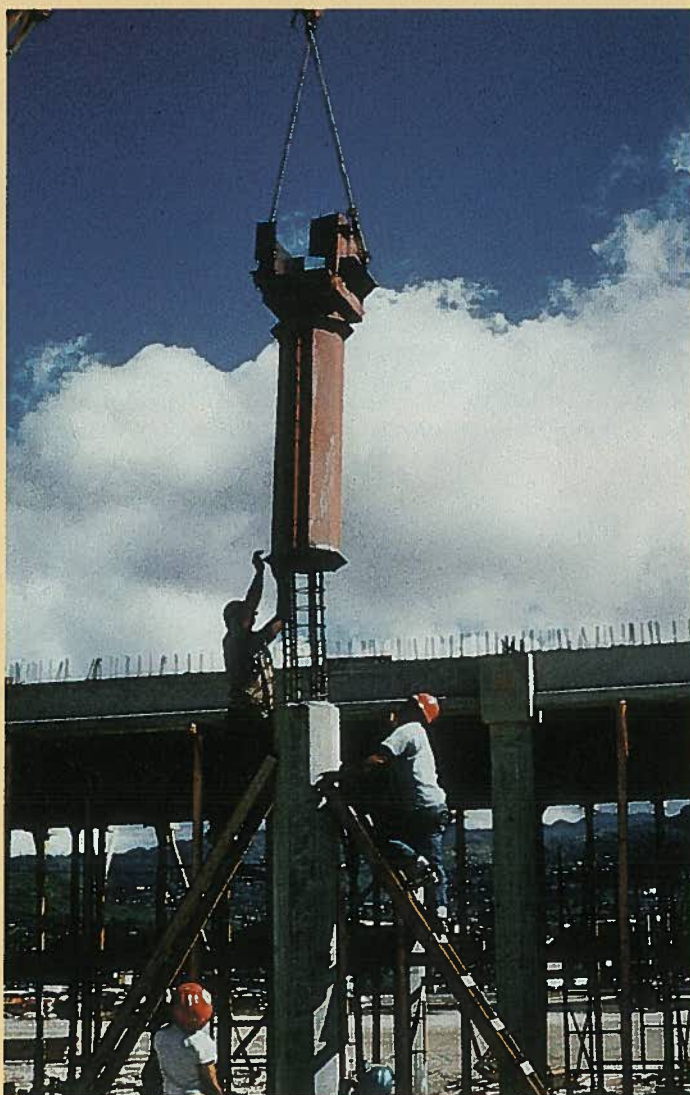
Prestressed concrete piling used as a freestanding column for the Ala Moana Shopping Center, Hawaii, circa 1956.
